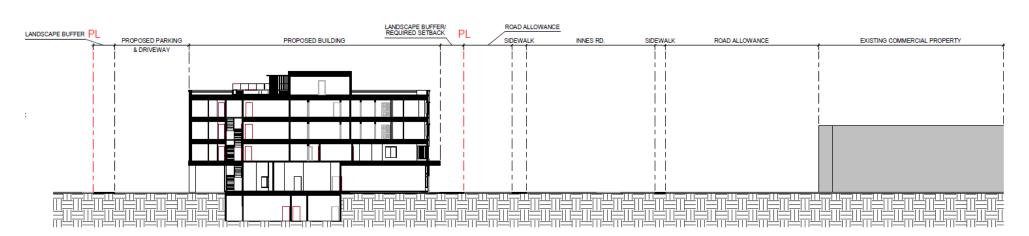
North to South Site Section showing relationship of building to adjacent properties
